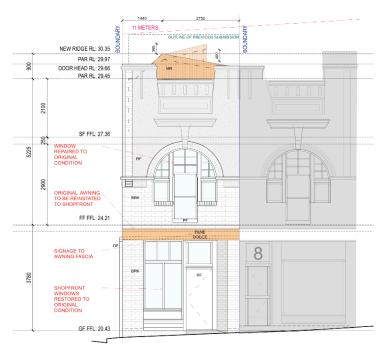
Part plan extract of front elevation demonstrating that the upper floor reads as a recessive element and not a storey even with the orange colouring used to shown new works.
